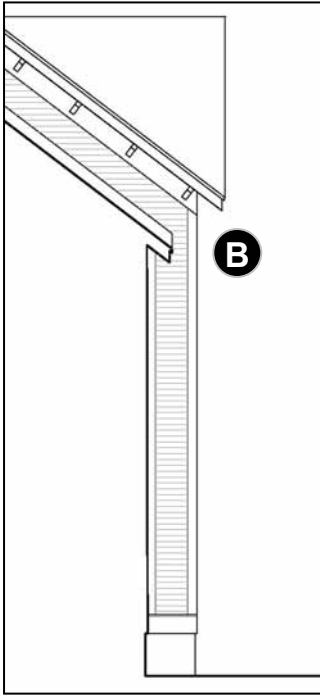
Side view of new addition up against historic building. By stepping the new façade back from the original one, the existing trim-work and details are preserved, and a clear line is established where the new addition begins. The new roof also matches the pitch of the old roof, but steps down to leave enough room for flashing without disturbing the original wood trim.
